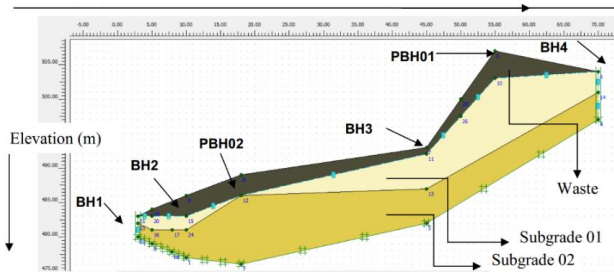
Modelling of Cross-section of new site and locations of boreholes.
